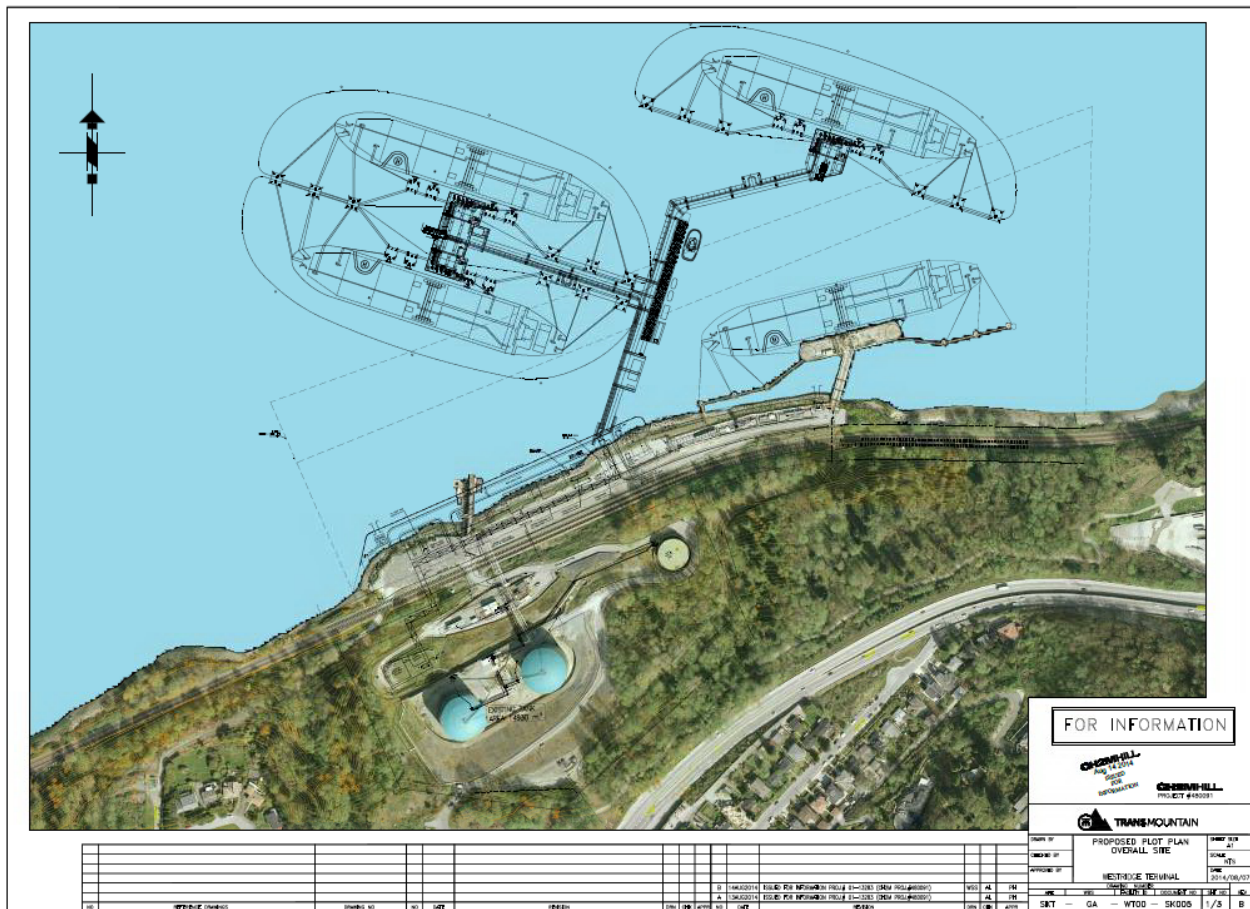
Westridge Terminal – Proposed Plot Plan, Overall Site
